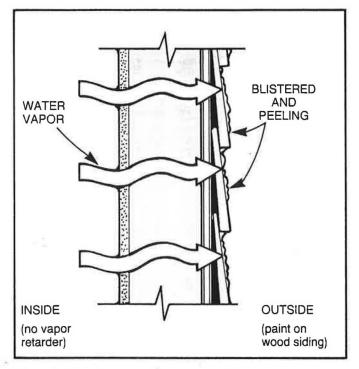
Exterior paint damage in a wall without a vapor retarder.
